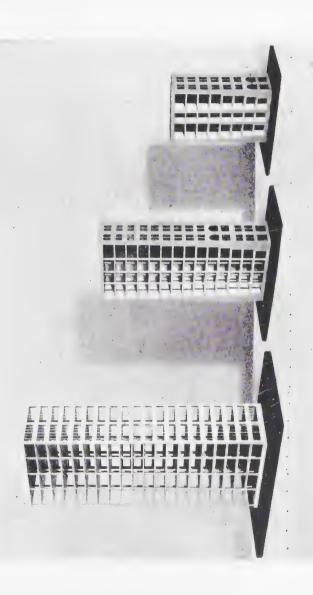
MODELS ILLUSTRATING MASONRY AND STEEL SKYSCRAPER CONSTRUCTION.
